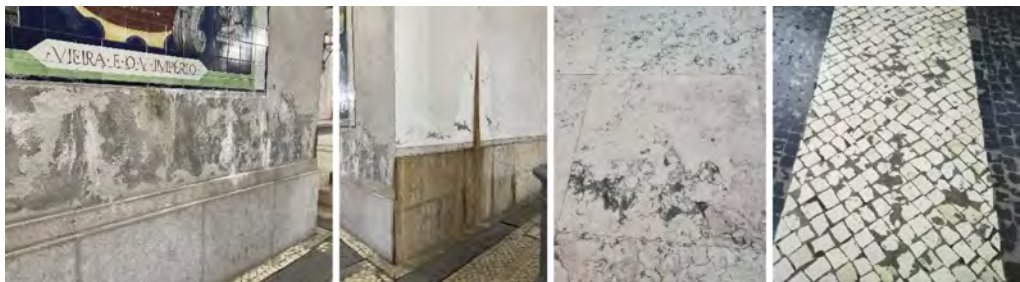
Interior infiltrations (a, b); worn out pavements (c, d).
